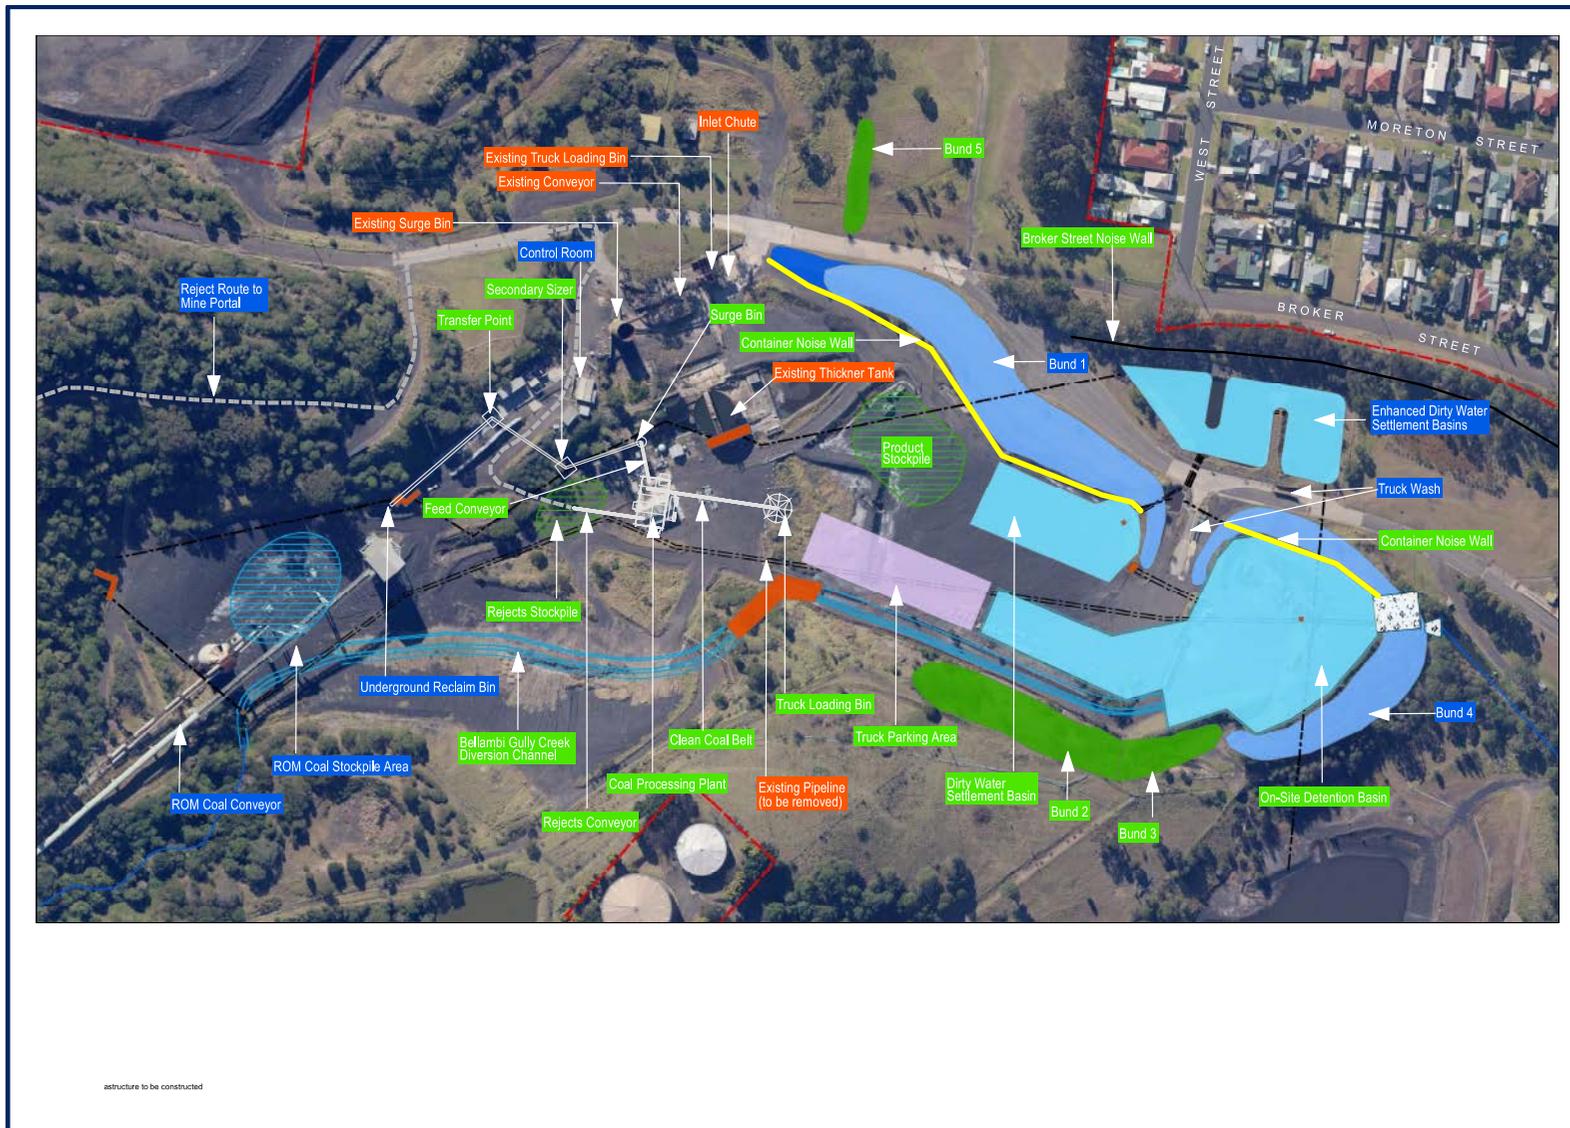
| Russell Vale Surface Site Facilities – Current and Proposed Plant and Infrastructure
